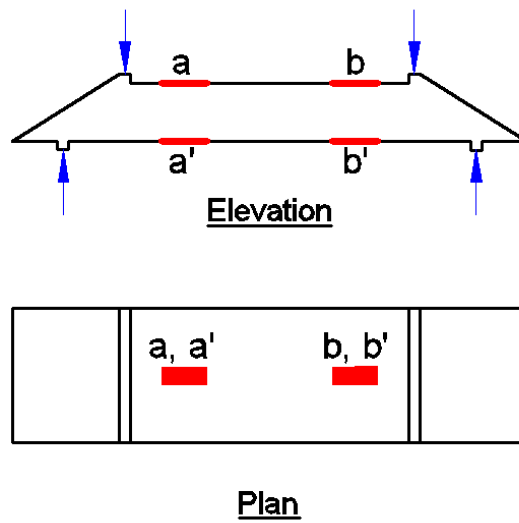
Elevation and Plan View of Fastening Shoulder Beam Insert Installed with Strain Gauges
